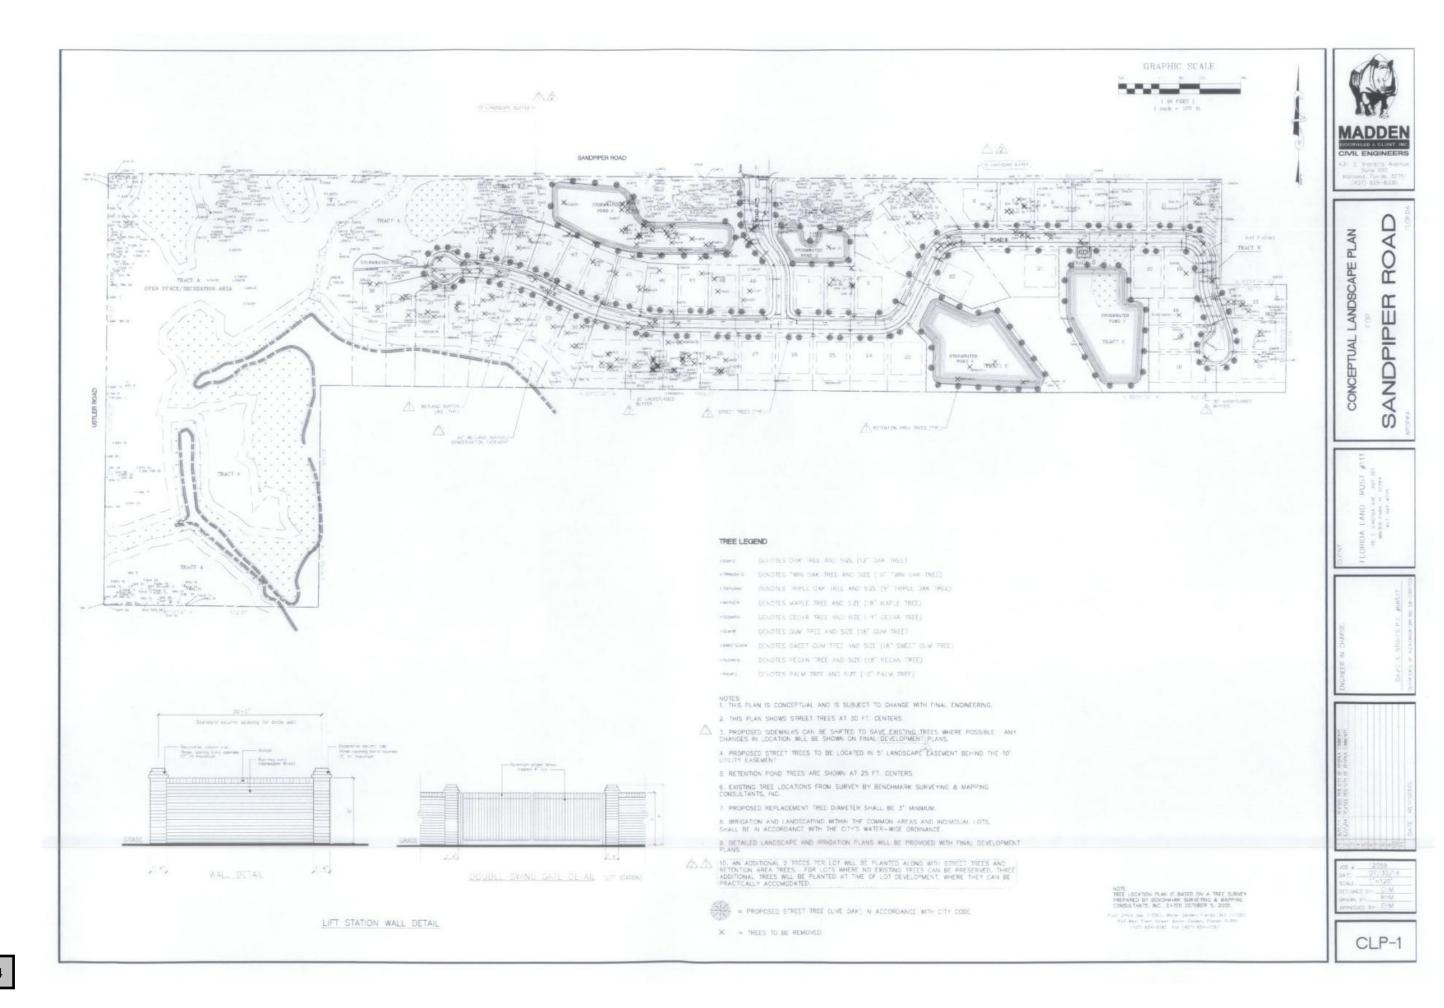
EXHIBIT "F" SANDPIPER MASTER SITE PLAN DEVELOPMENT STANDARDS
